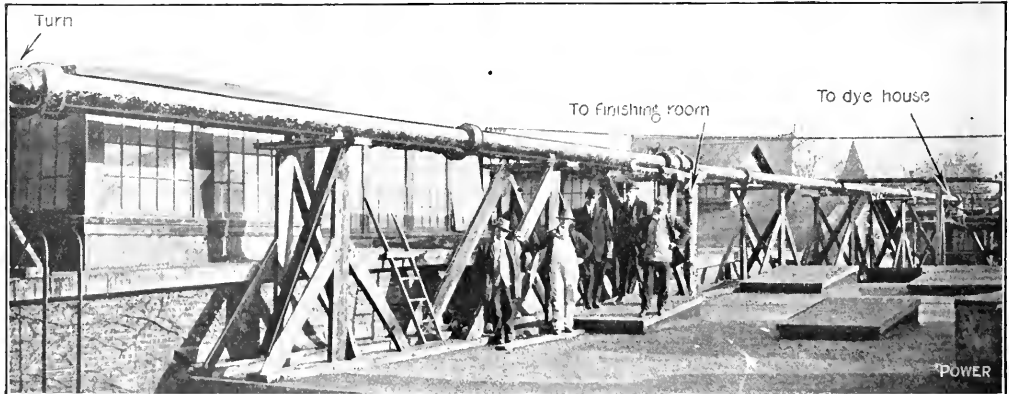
NEAR VIEW OF PIPE LINES ON ROOF AND METHOD OF SUPPORTING THEM
